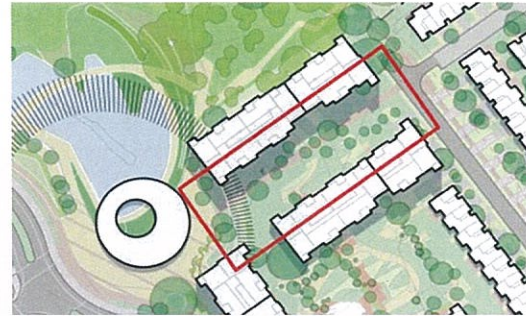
Extract from Figure 1 – Indicative Legacy Master Plan – Cross Block Link Zone, AAA
